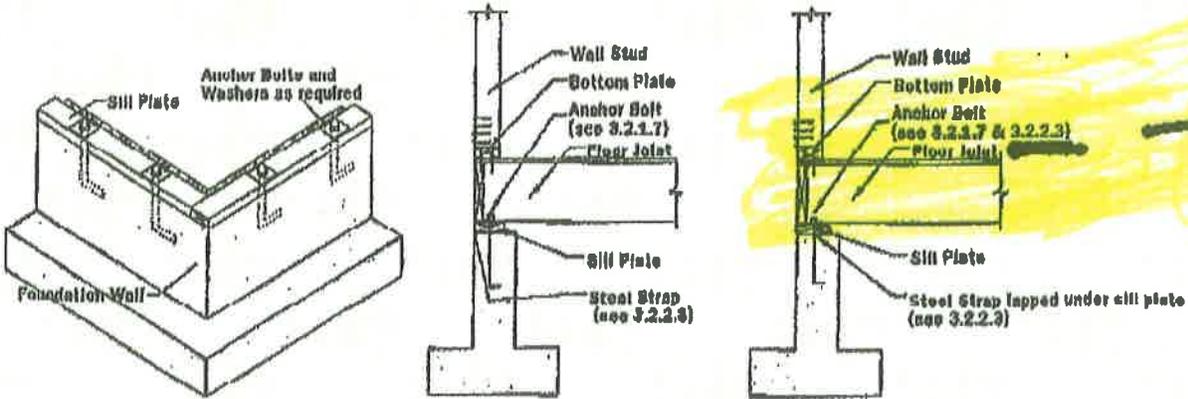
Sill Plate Anchorage to Masonry Foundation Wall
